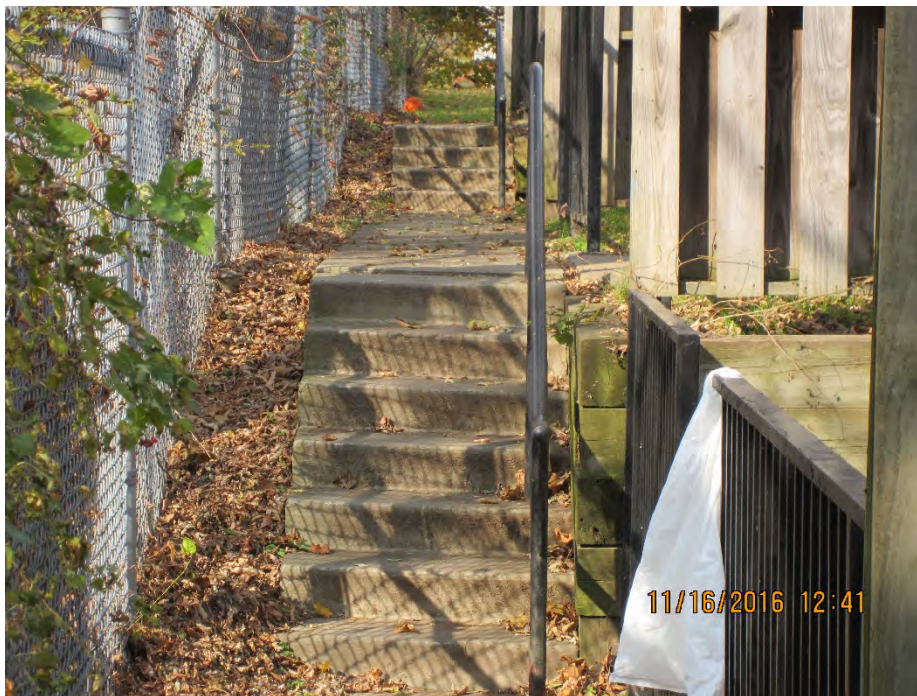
Grind & caulk top step [Plan Sheet SP-2]
